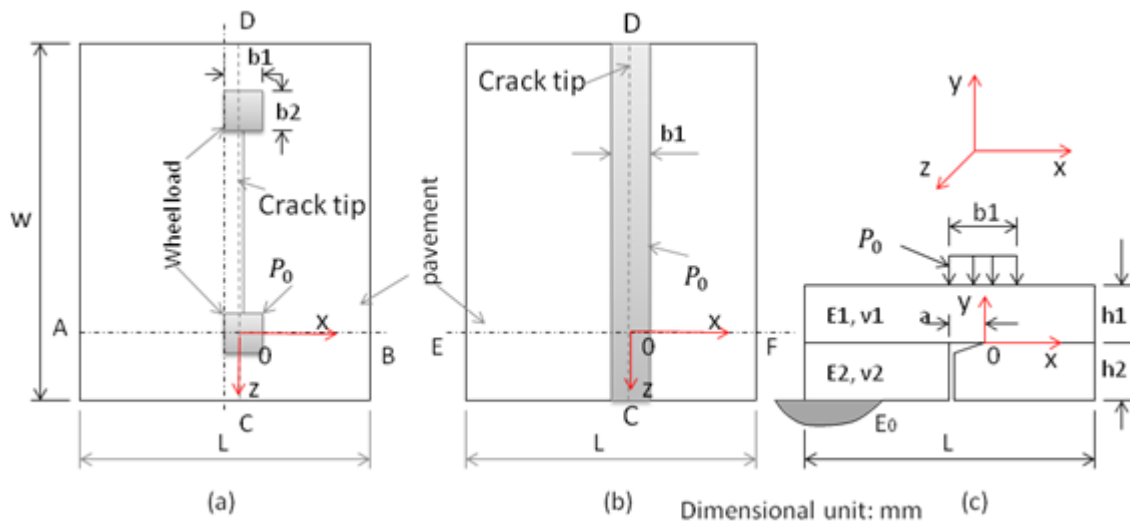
(a) a lane-width pavement subjected to vehicular wheel loading, (b) a lane width pavement subjected to a pressure load through the width, (c) simplified model for loading mode (b)
